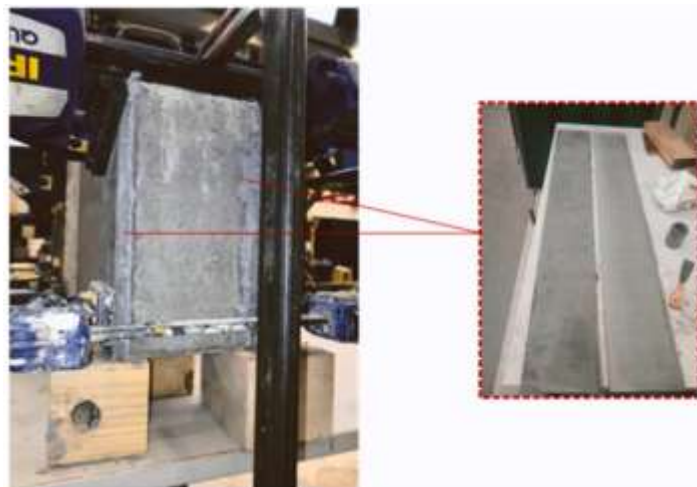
precast concrete beam strengthened with UHPFRC panels, source: (Huang, Gu, Mustafa, Grünwald, & Luković, 2023)
